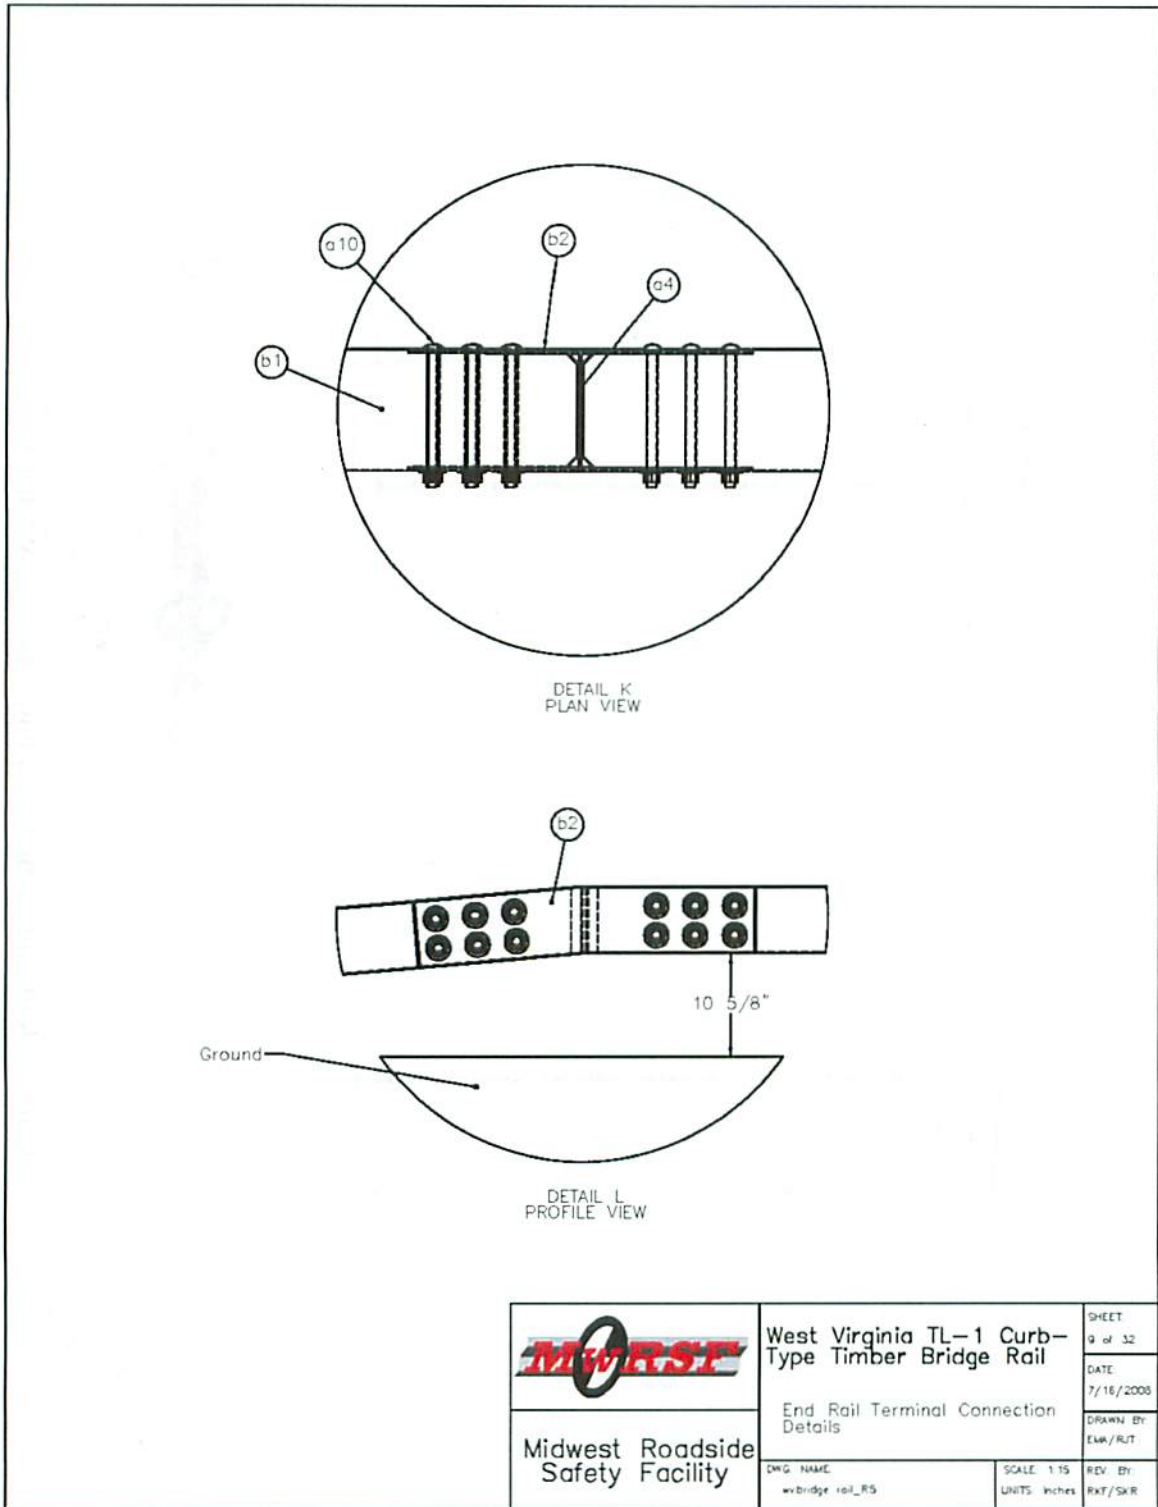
Rail End Treatment Connection Details, Test No. WVBR-1
